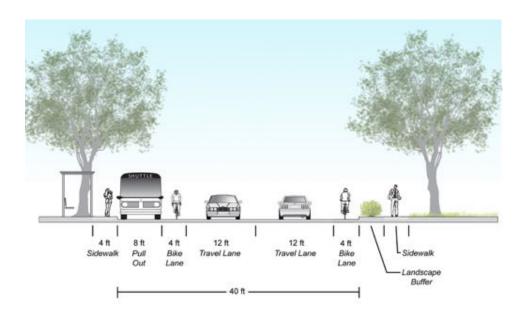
Existing and Future Sections of Forbes Boulevard
